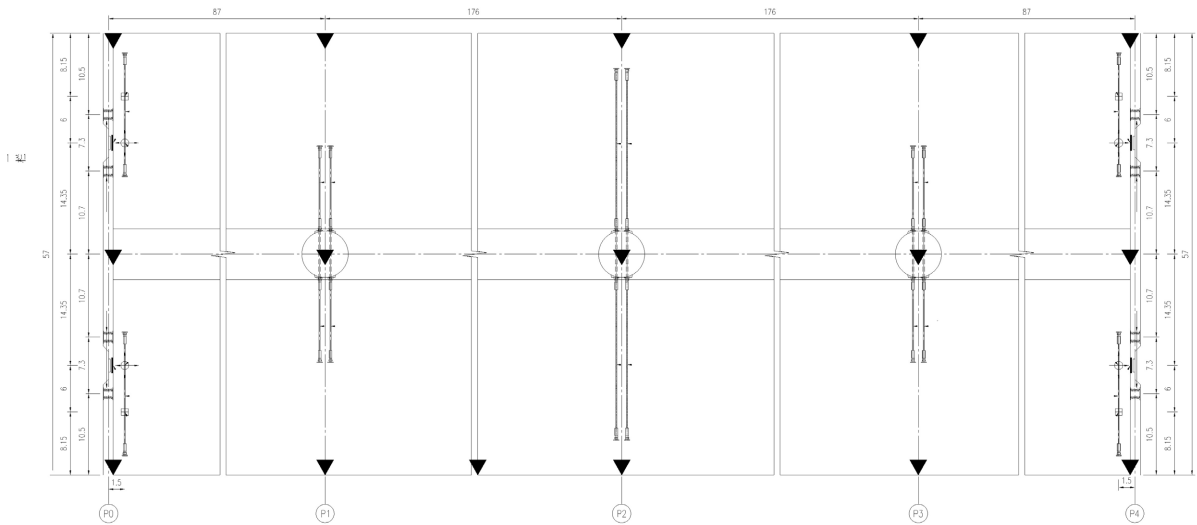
Schematic diagram of the layout of linear change monitoring points after the installation of steel box girder (plan)
